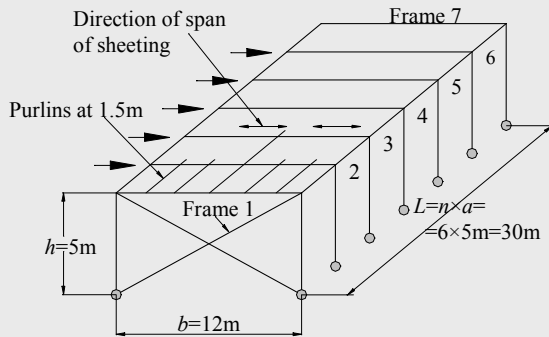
Flat roof building with roof sheeting spanning perpendicular to the length of the building
